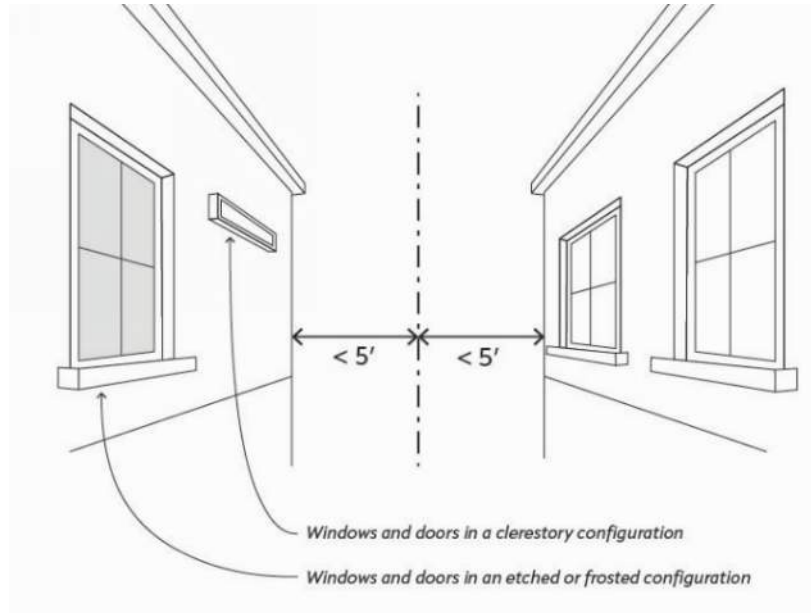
(A)(2)(a)-A: Window and Balcony Placement and Design
